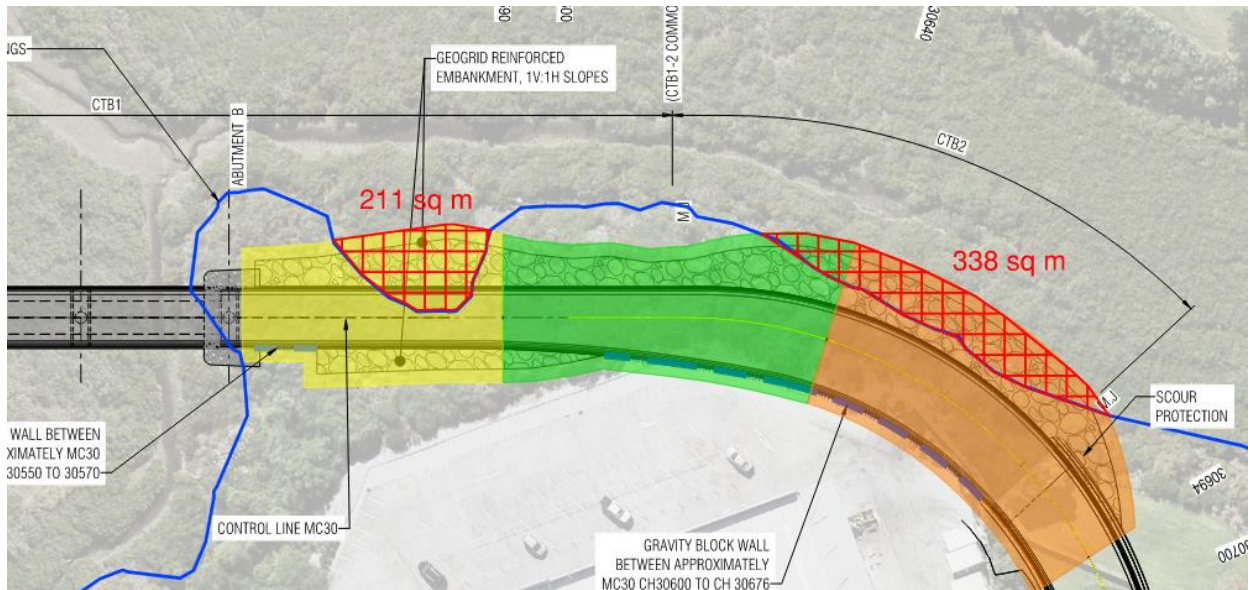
Location of Bridge B Northern Abutment Reclamation
